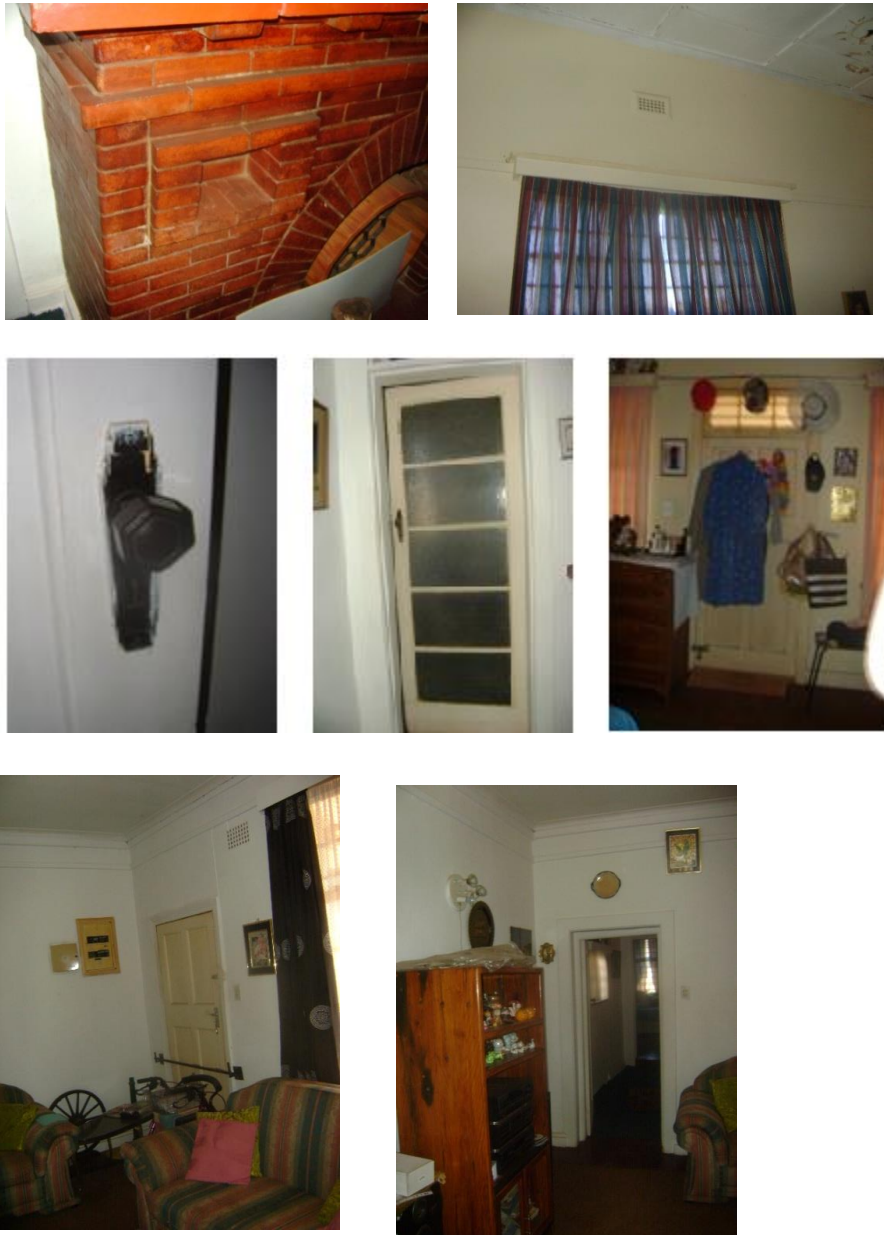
Images of details of windows, doors, ironmongery, ceiling and flooring in the old section of the building under investigation. Some of the original doors were removed at some unknown point in time. (Photographs S.M. Miller 2016.)
